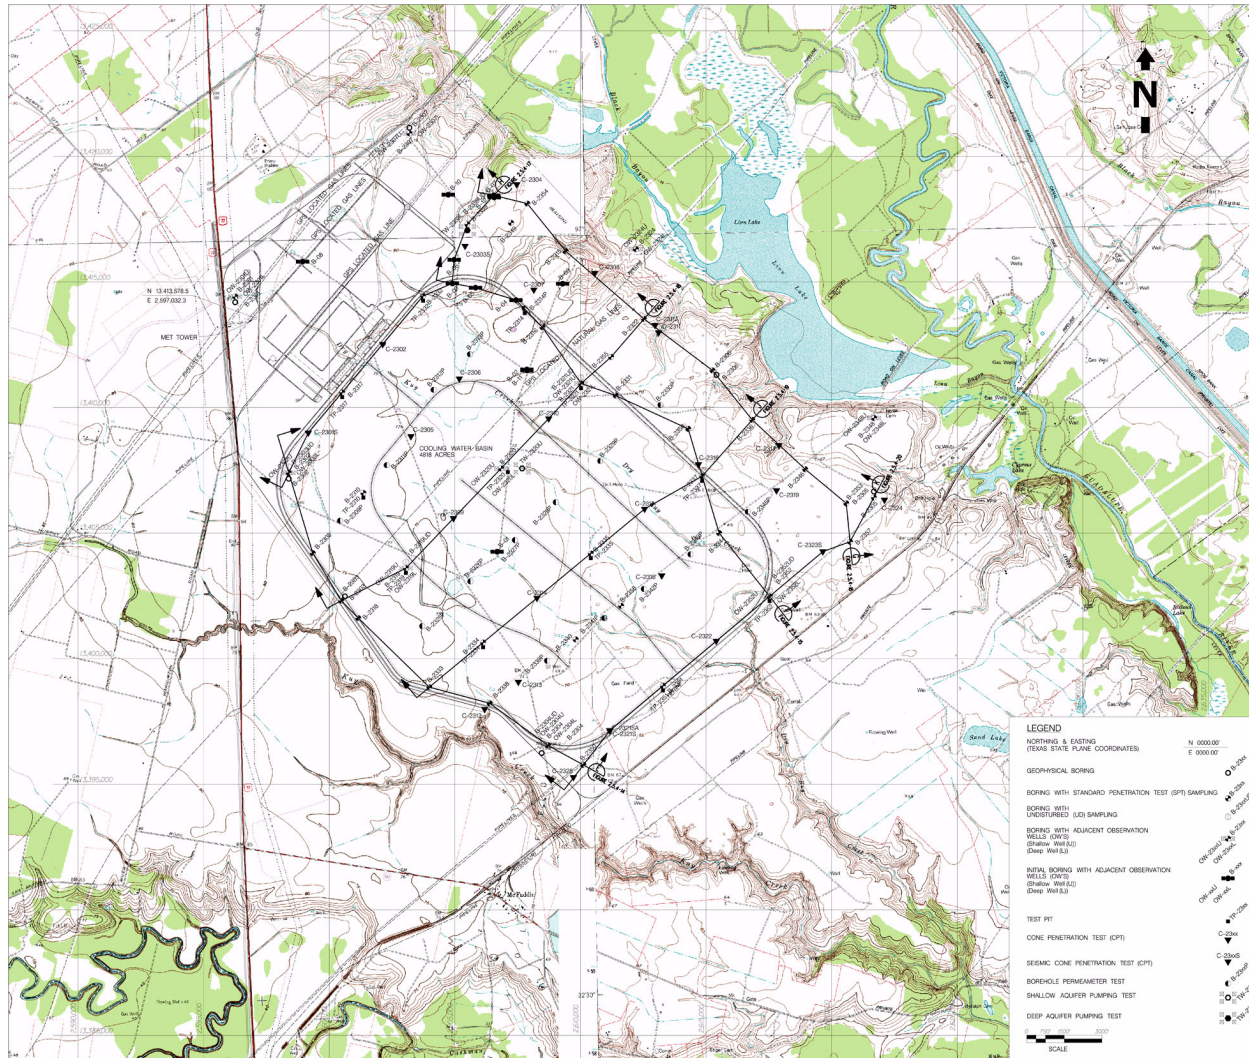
Subsurface Profile Plan (Cooling Basin)
